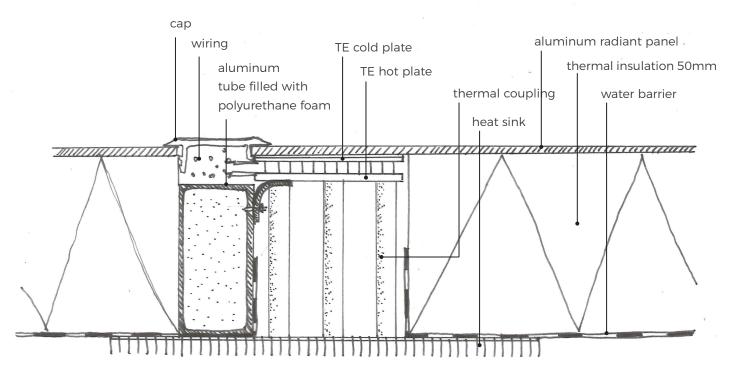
Horizontal Section - Step 3. Cold plate of TEM connected to aluminum radiant panel and hot plate coupled to heat sink. TE is mounted on one aluminum tube filled with thermal insulation. There is place for wiring and also a removable cap on the inner side for access. Rigid foam thermal insulation 50mm, water barrier. Thermal bridge due to connection to tube.
